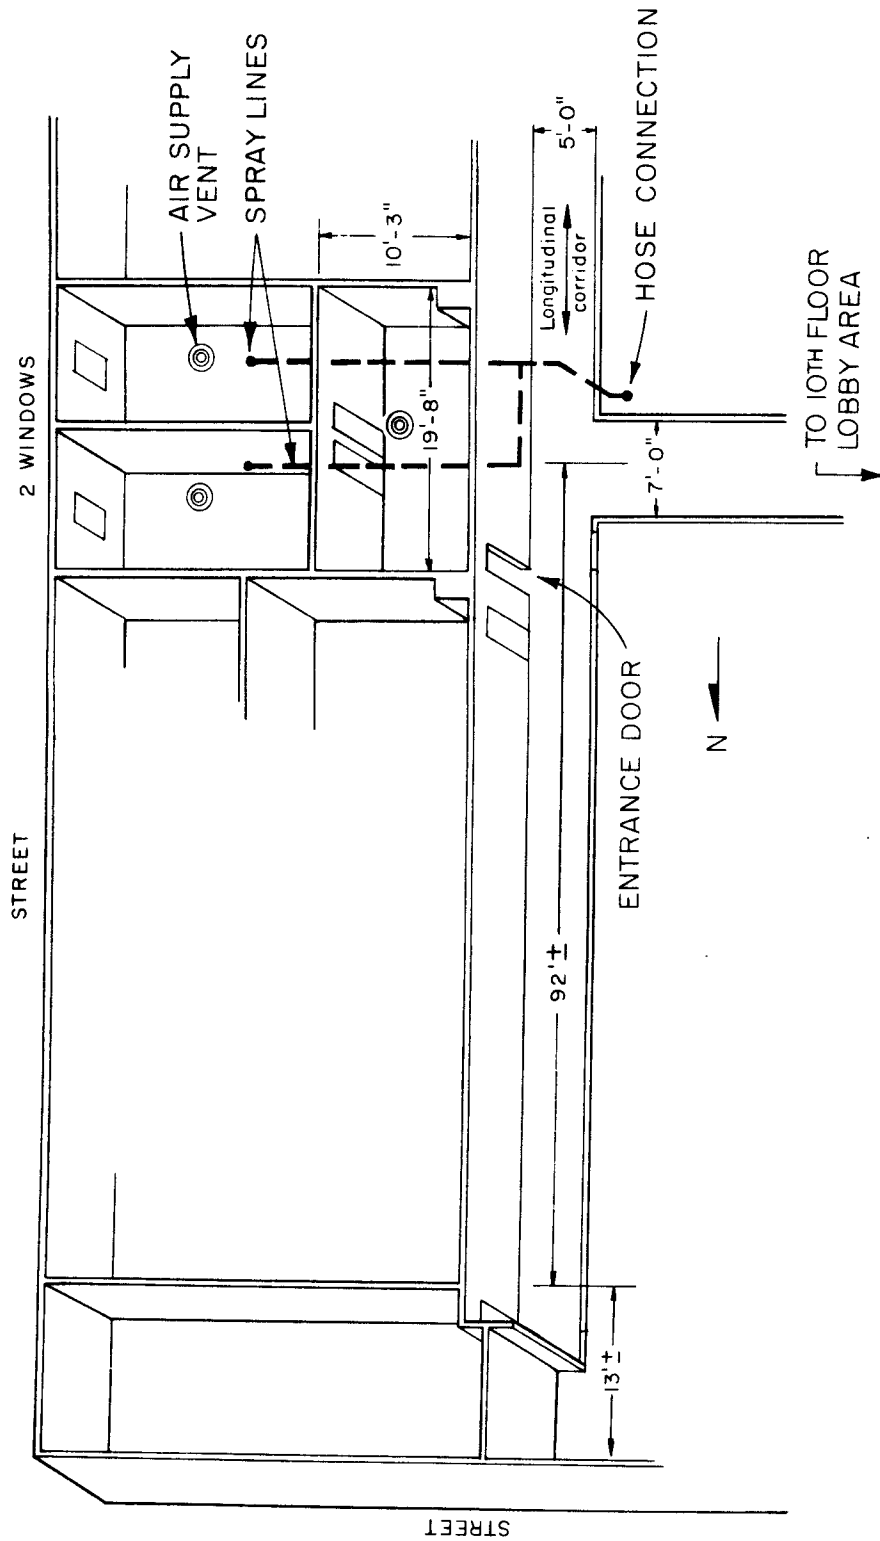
LAYOUT OF 10th FLOOR, FIRE TEST # 3
